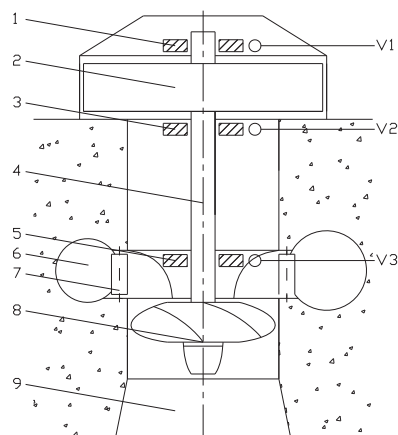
Hydroturbine sketch. Hydroturbine schematic: 1—upper guide bearing, 2—generator rotor, 3—thrust bearing, 4—main shaft, 5—water turbine guide bearing, 6—spiral case, 7—guide vane, 8—turbine runner, 9—draft tube. Measurement point configuration: V1—at upper guide bearing, V2—at thrust bearing, V3—at water turbine guide bearing.
